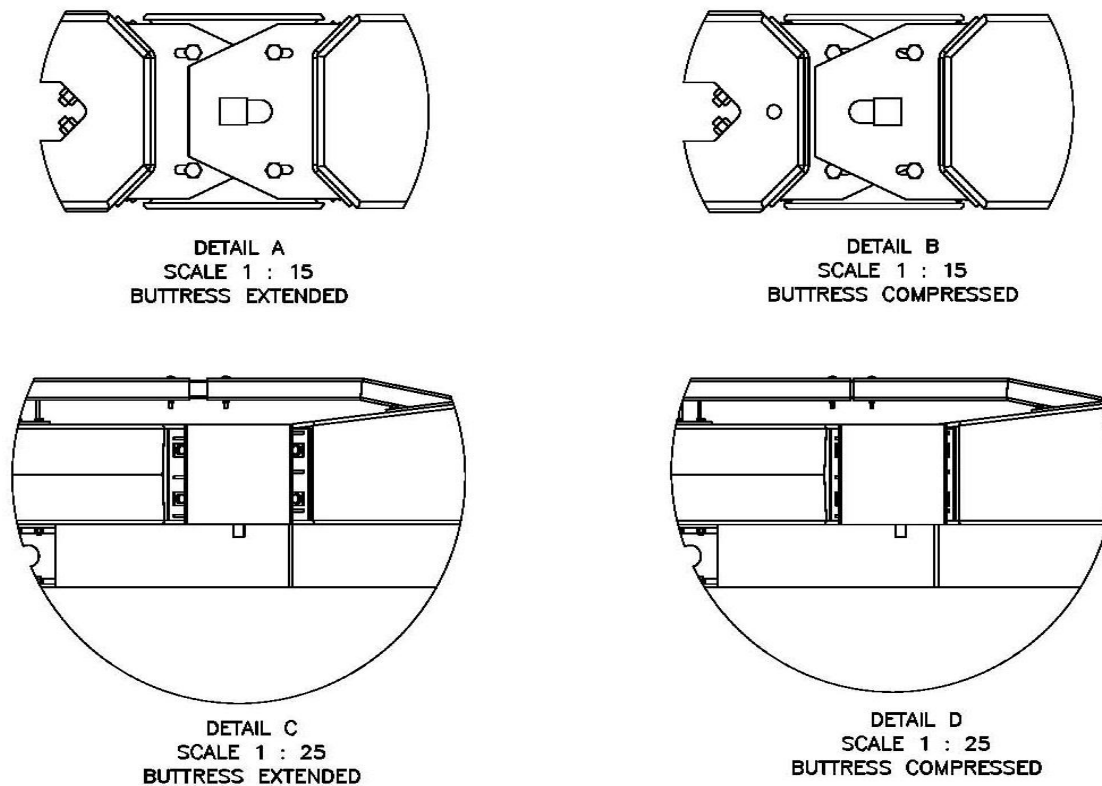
Compressed and Extended Joint Views, Straight Cover Plate
